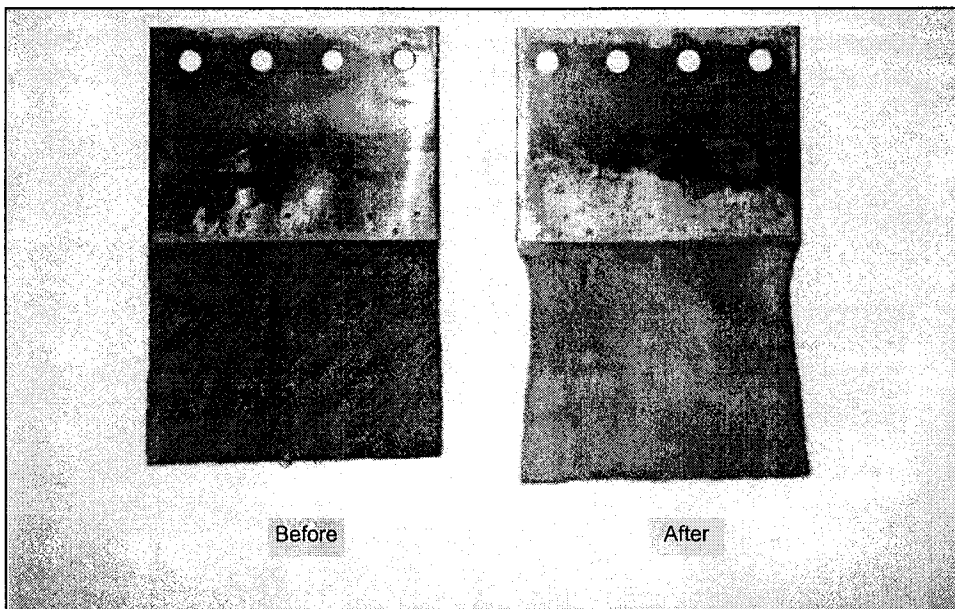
Plan view of a geotextile test specimen before and after pull-out testing
